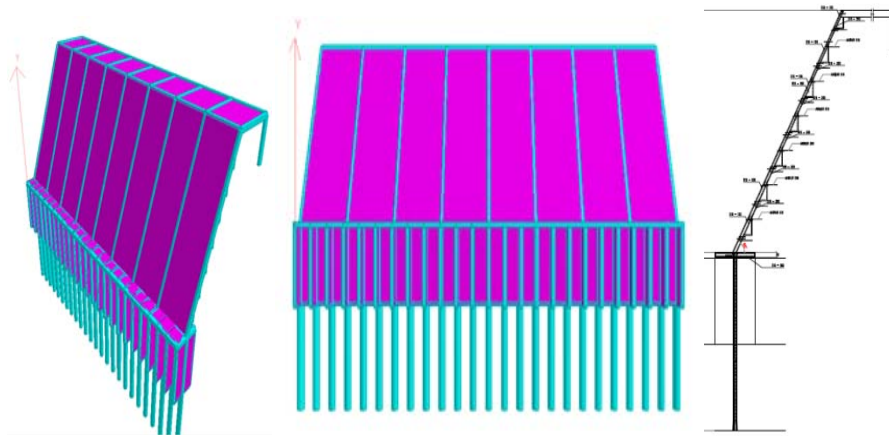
Slope wall protection with the artificial grasshoppers foot method
